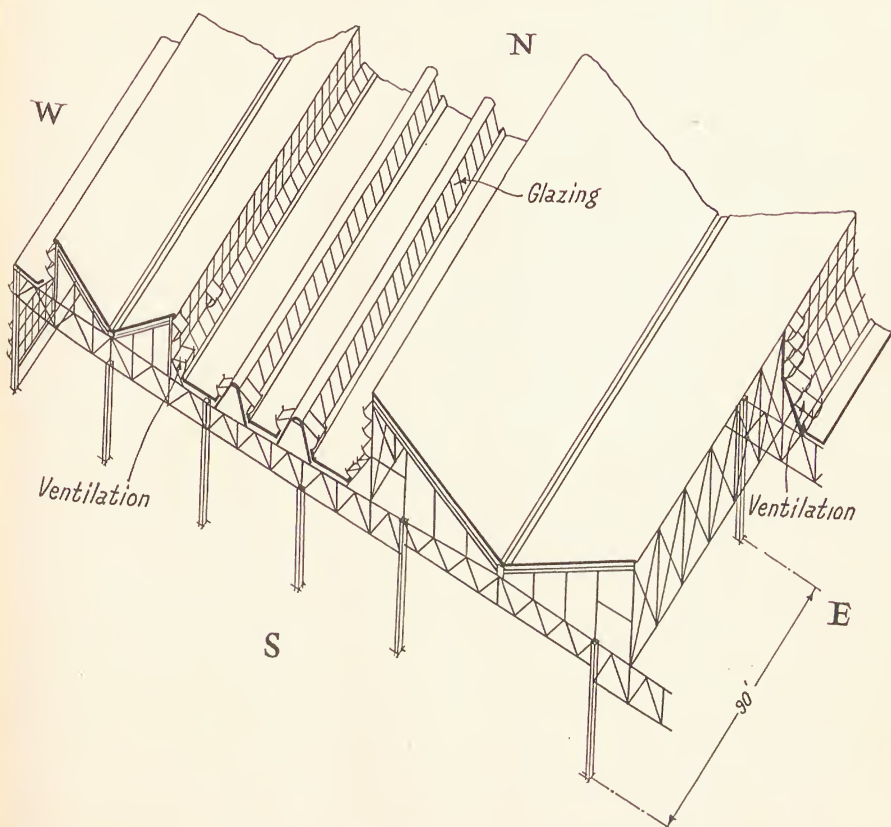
ENLARGED DETAIL OF ROOF CONSTRUCTION FOR FACTORY SHOWN AT THE TOP OF FIG. 12. NOTE THE ORIENTATION AND SPECIAL PROVISIONS FOR ROOF VENTILATION
